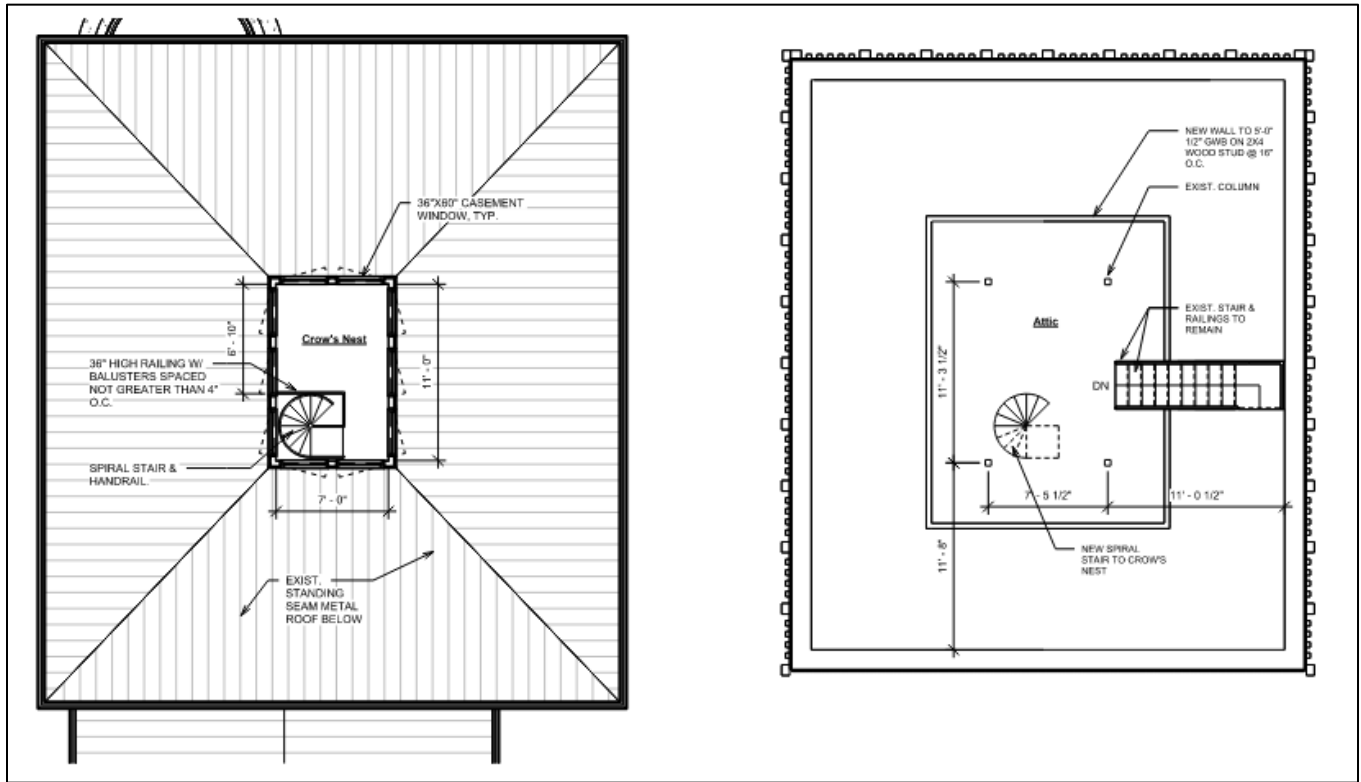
Aerial site/floor plan of cupola addition to roof and attic.
